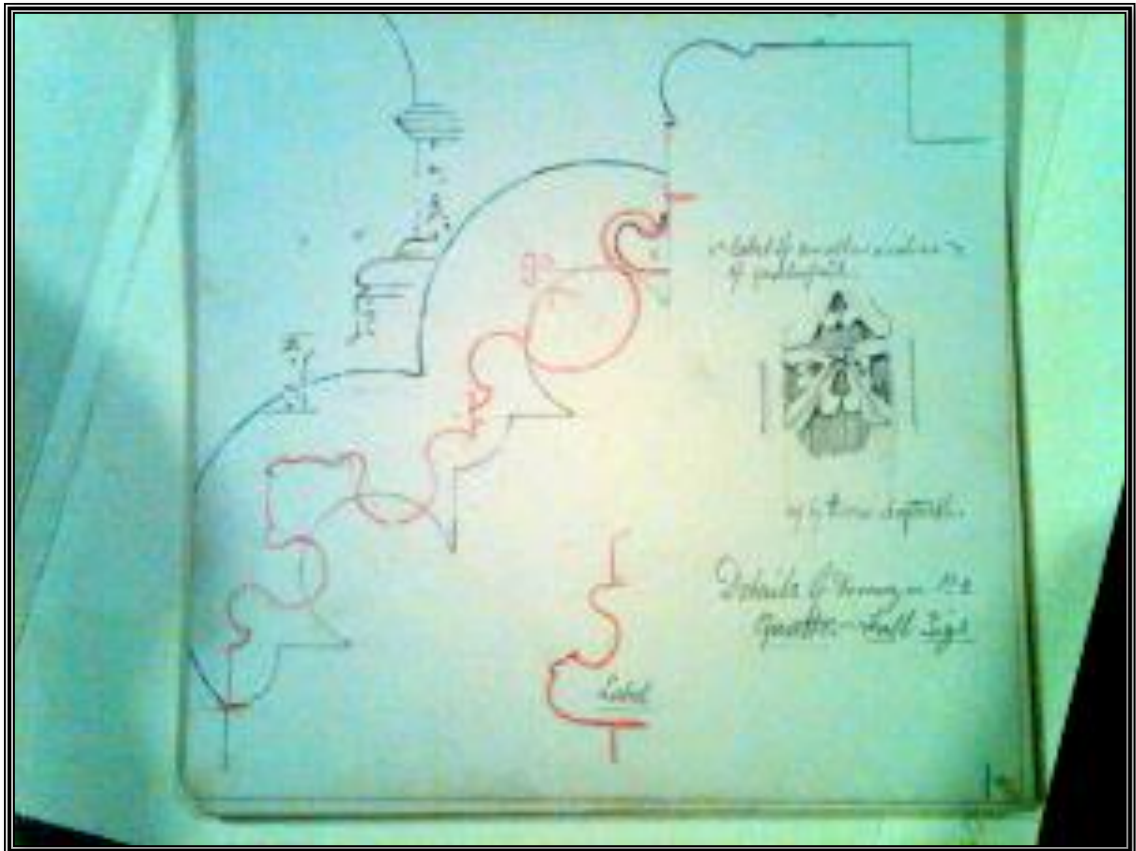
Frank Miles Day. Section drawings of column in church of St Cross, Winchester, 1885. Pencil and ink. Architectural Archives, University of Pennsylvania.
